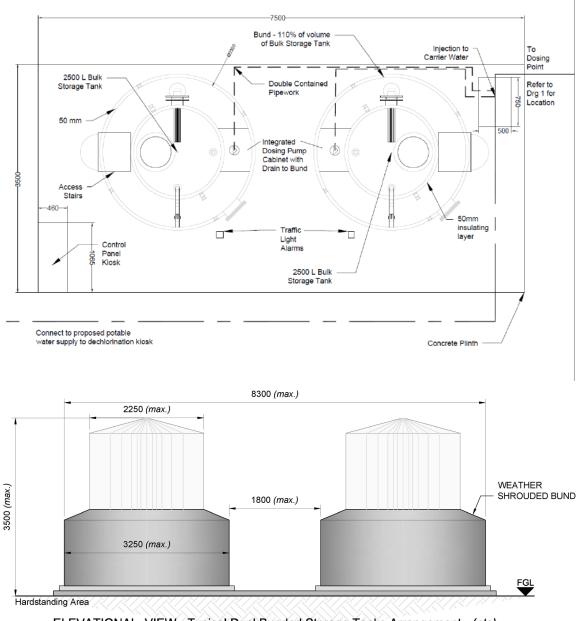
Plan and Elevation Drawings of a typical Orthophosphate Dosing Unit
